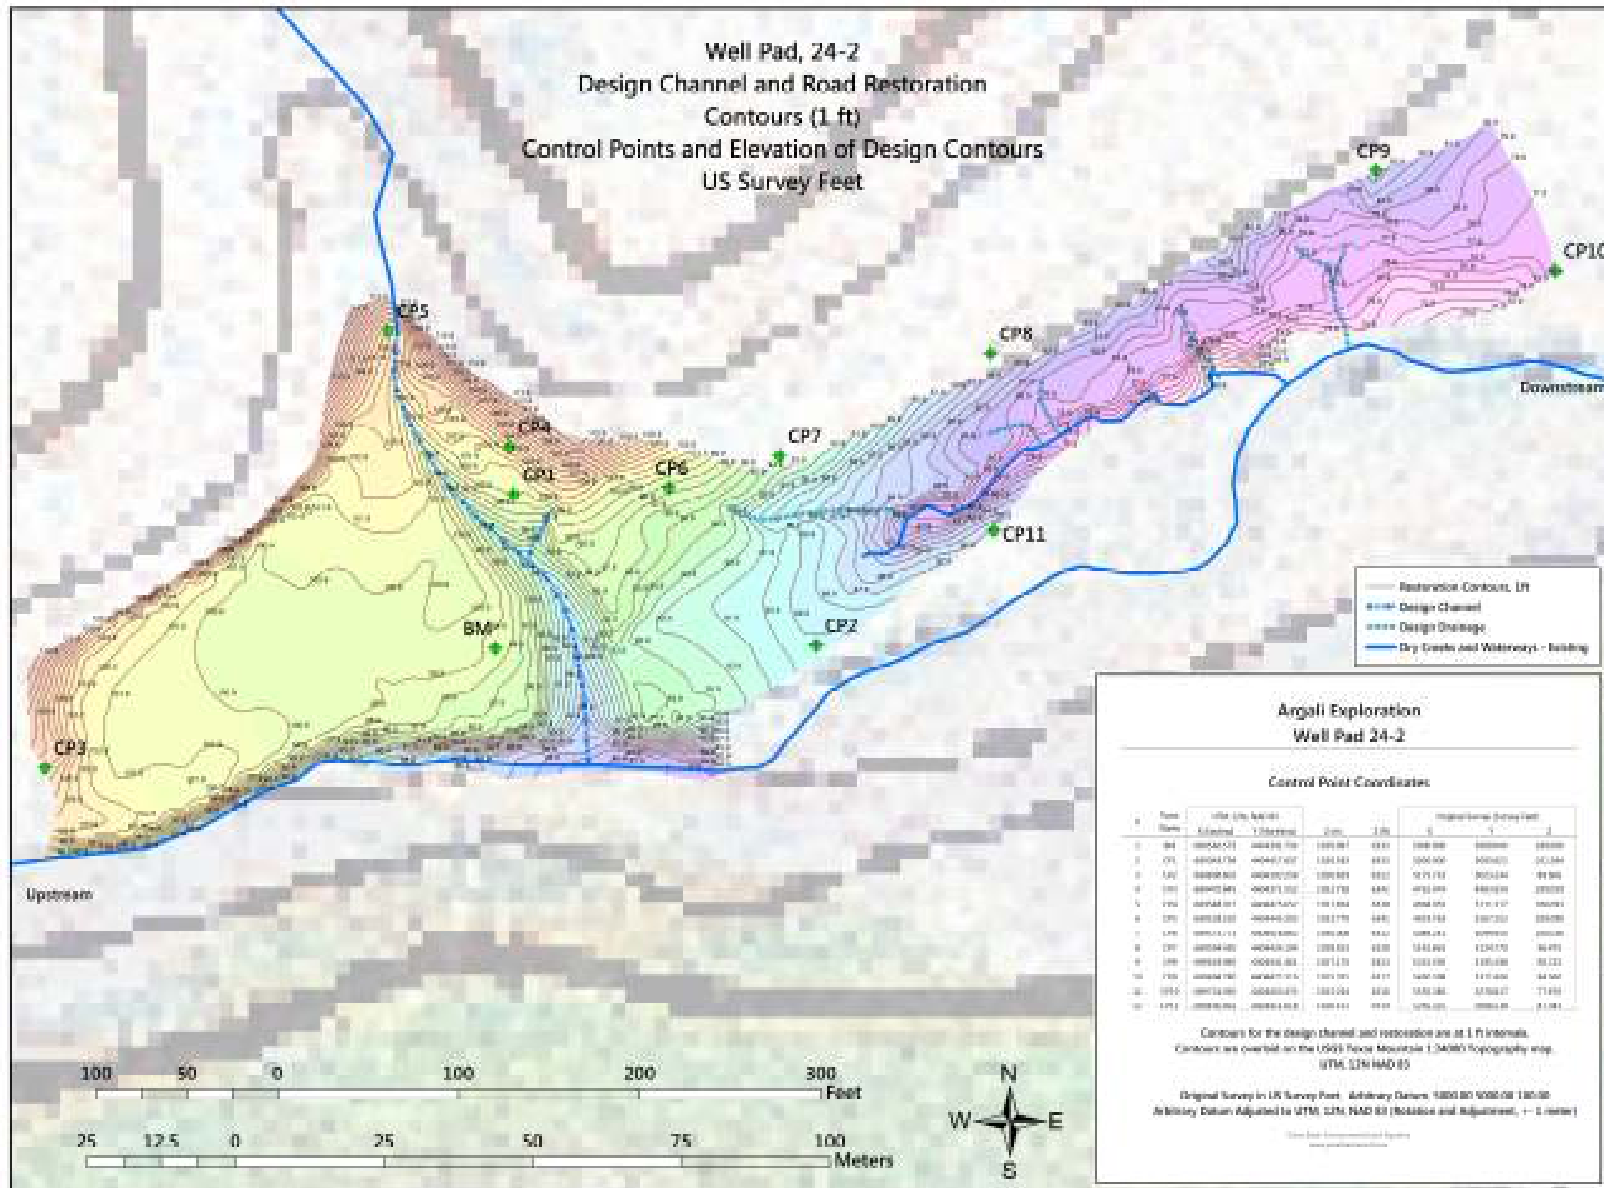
Overview of control points, design topography with elevations in feet, and drainages.
